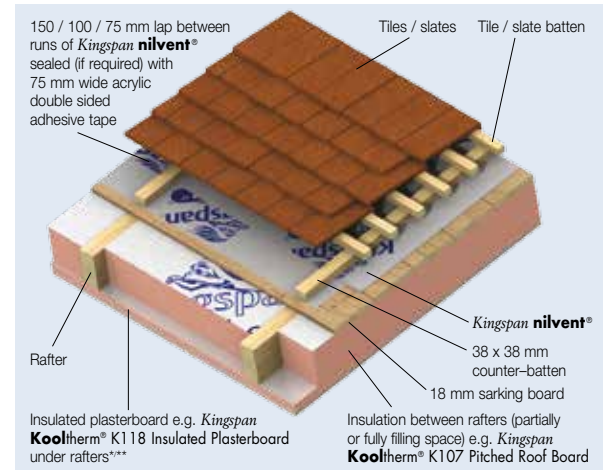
Insulation Between Rafters – Sarking Board – Battens & Tiles
